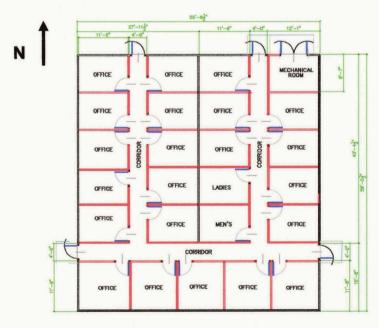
Proposed AFRL/VSE Integrated Experiments Building Schematic Floor Plan
